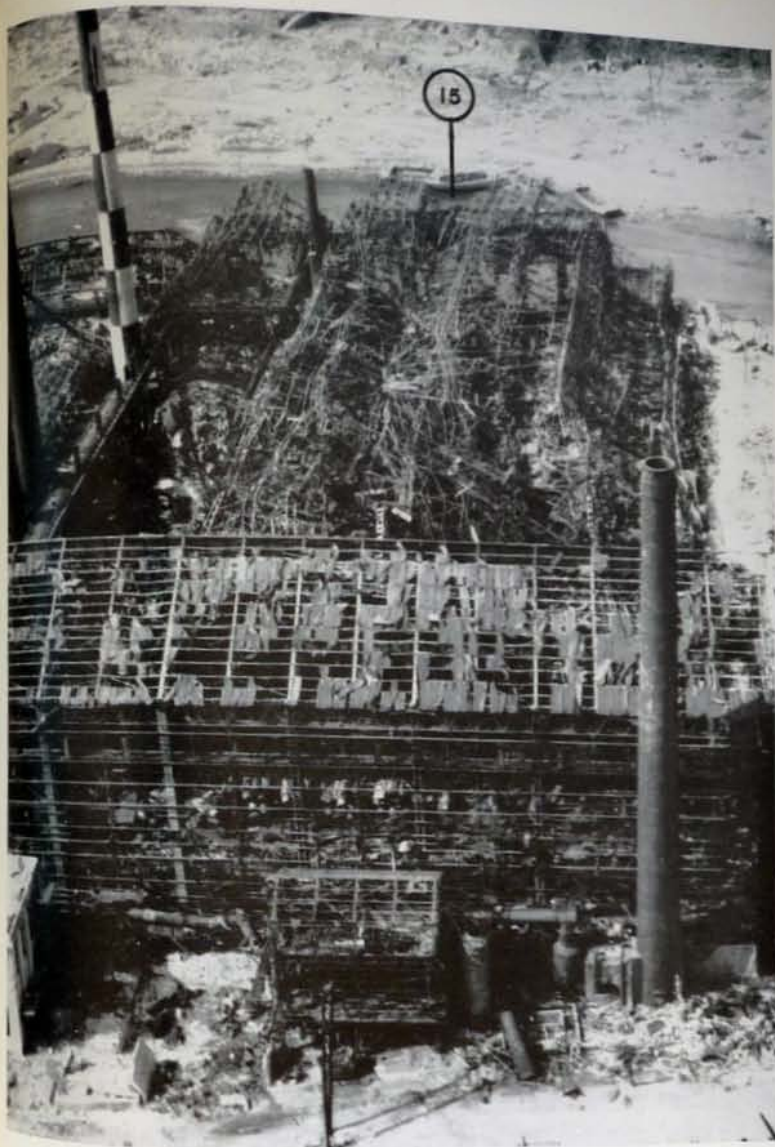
3,900 feet from GZ. Group 26. Looking west. Building 19 in the foreground.
